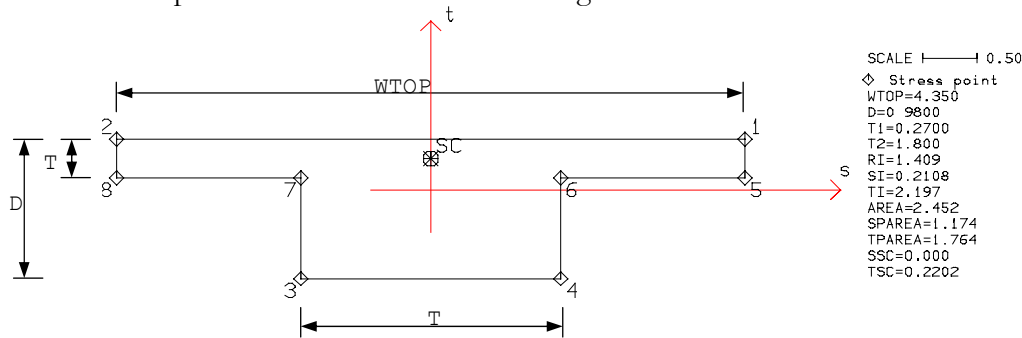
Constant T-shaped cross-section used in the beam element models.
